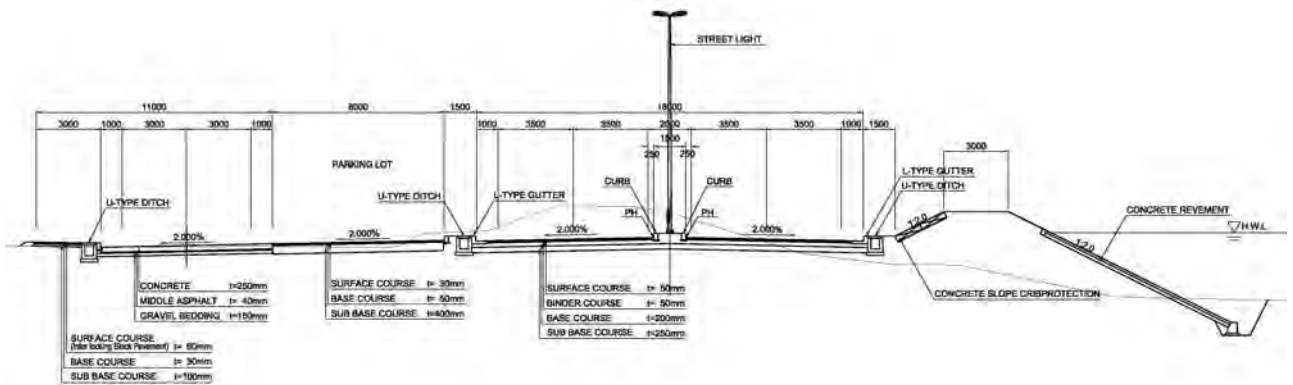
(4) Typical Cross Section Parallel to West Industry Road
